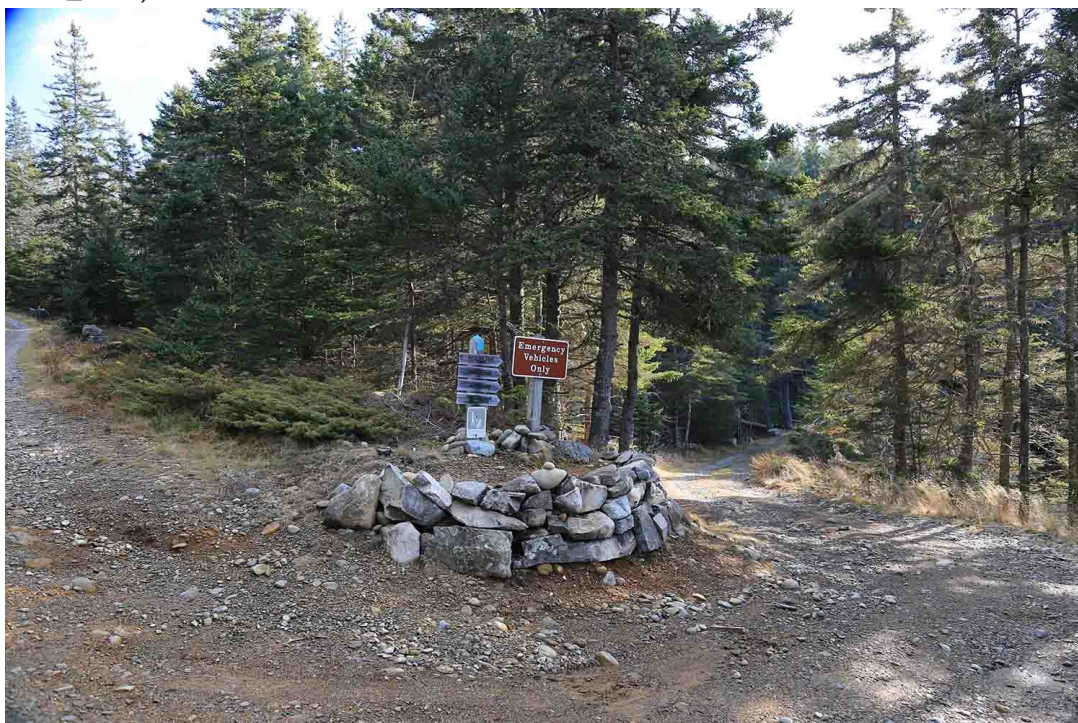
View of the retaining wall at the intersection of the Loop Road (image left) and Fire Road (image right). (OCLP 2016, IMG_0165)
